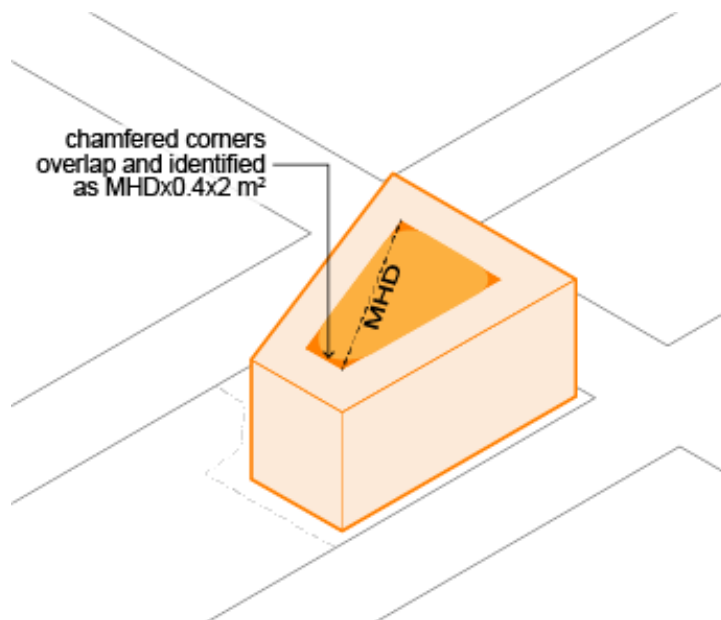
Demonstrating the maximum horizontal dimension and chamfered corners of the Tower Component Area
